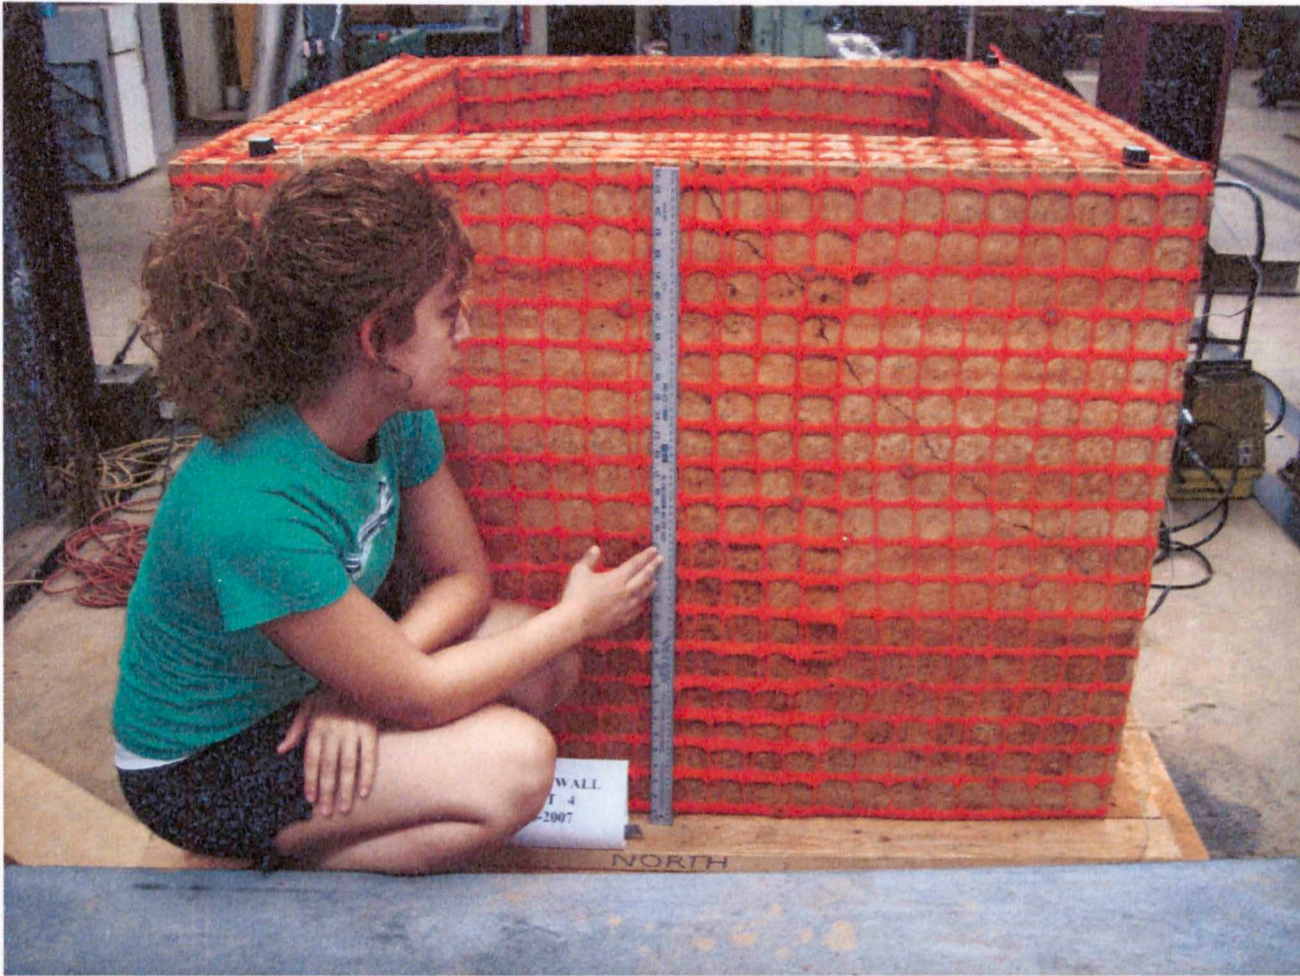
Test 4 view of diagonal crack along north wall with mesh after test
